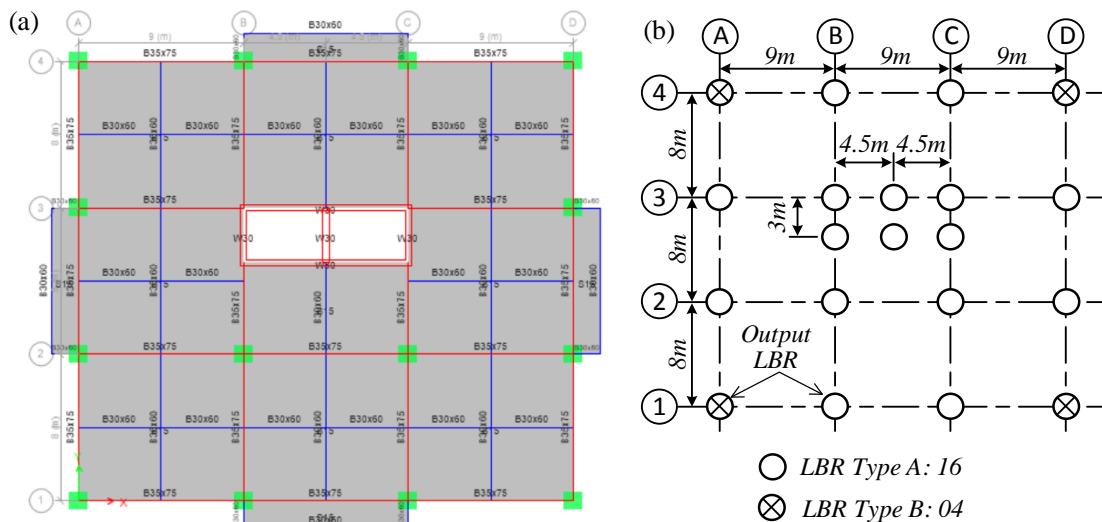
Specific floor plan model of the building analyzed (a) and LBR plan for designed (b).
